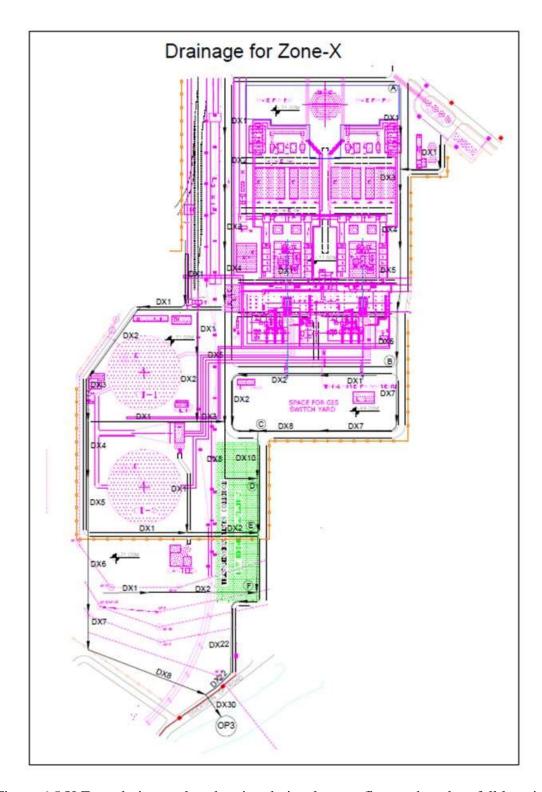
X Zone drainage plan showing drains, longest flow path and outfall location
